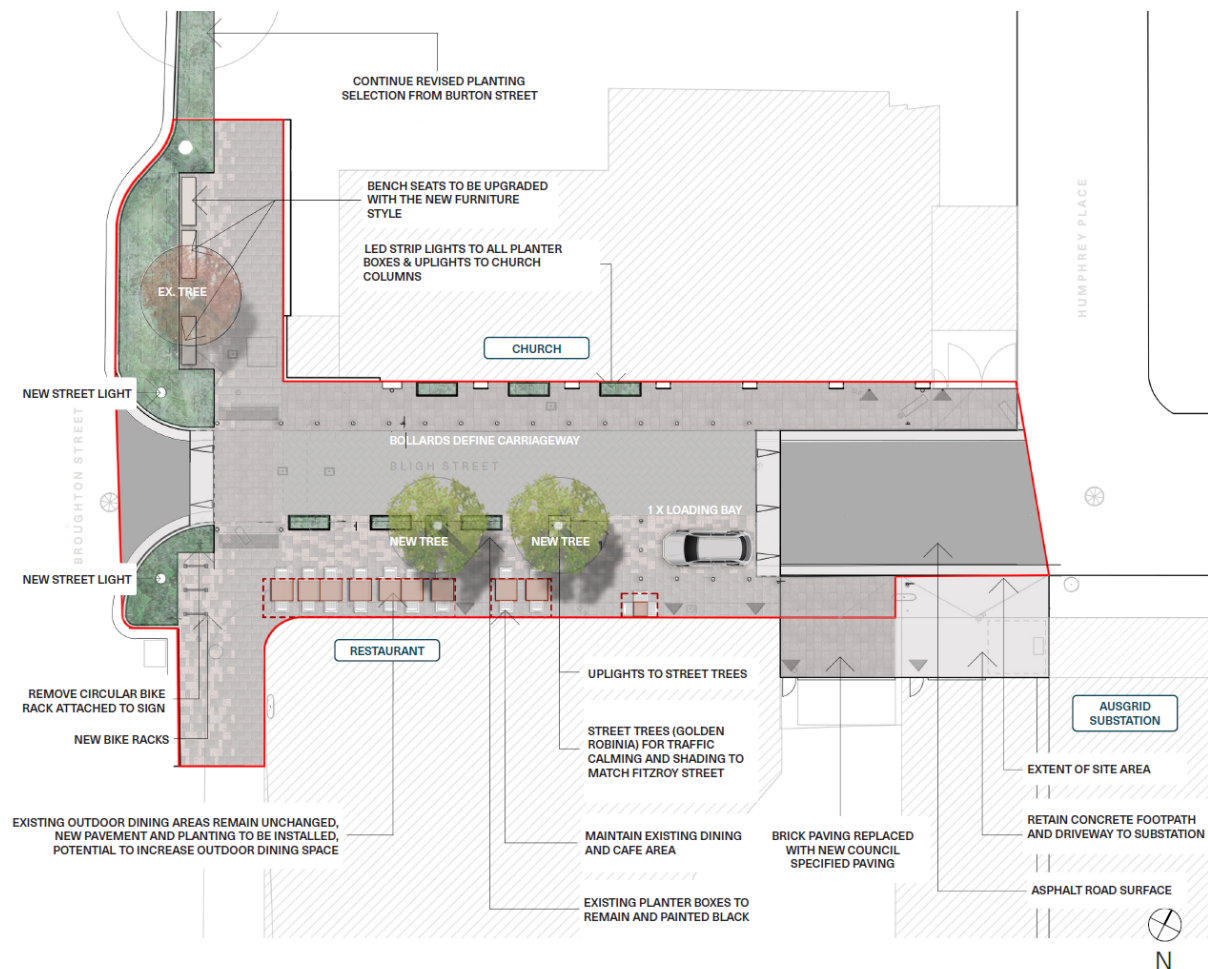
Bligh Street Shared Zone Layout (Same layout for Option 1 and Option 2)
